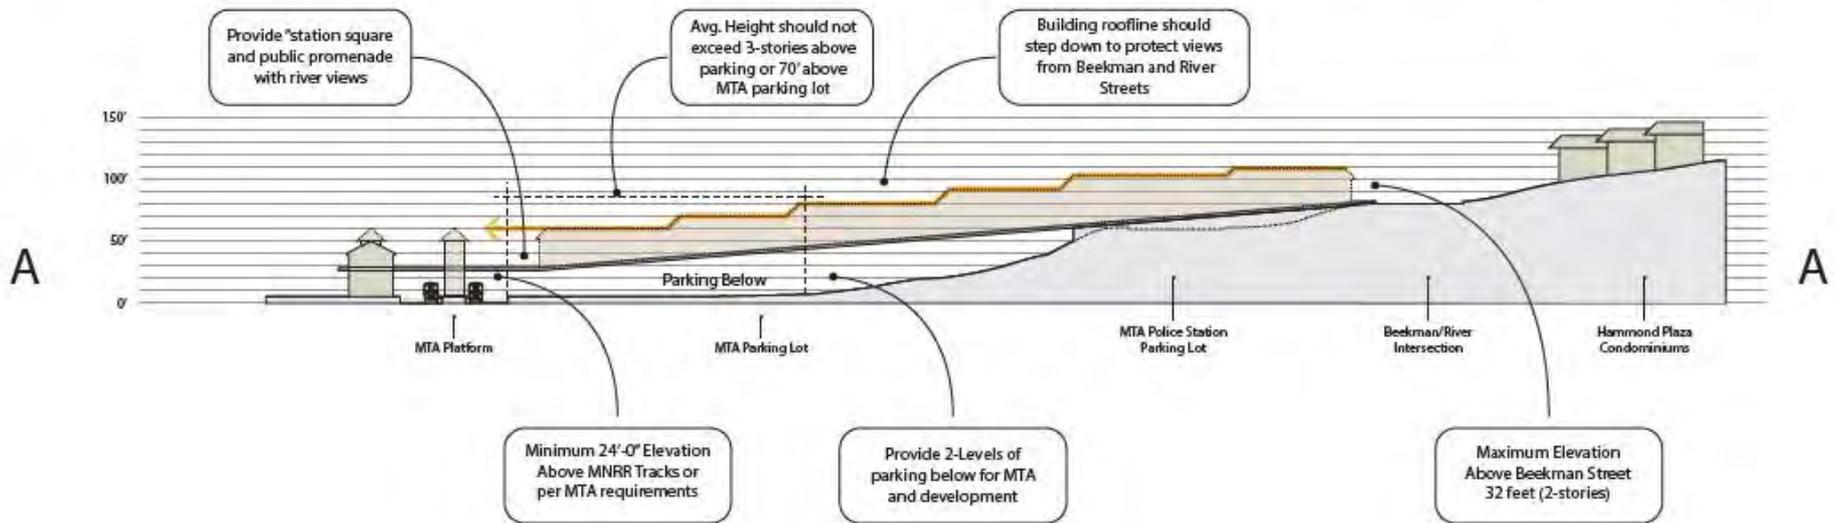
WATERFRONT/STATION AREA DEVELOPMENT PROFILE (SOUTH SITE)
